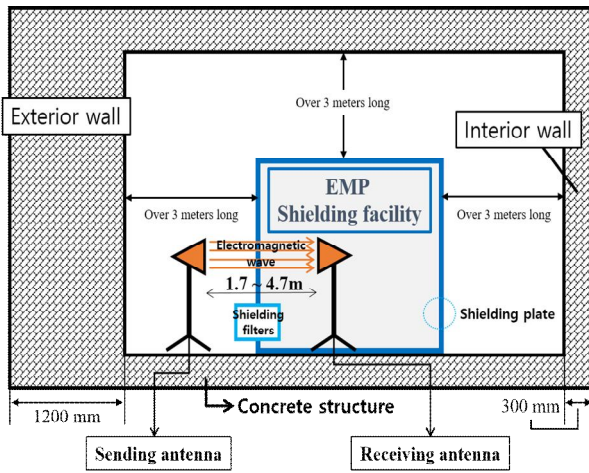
Floor plan of a conventional EMP shielding facility(9)
